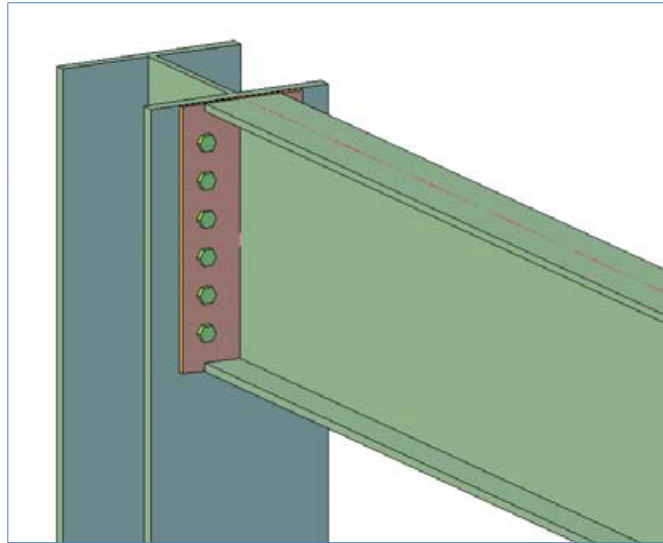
SINGLE SIDE END PLATE JOINT WITH SIX VERTICAL BOLTS IN GROUP 1 AND CENTER BOLT LAYOUT
